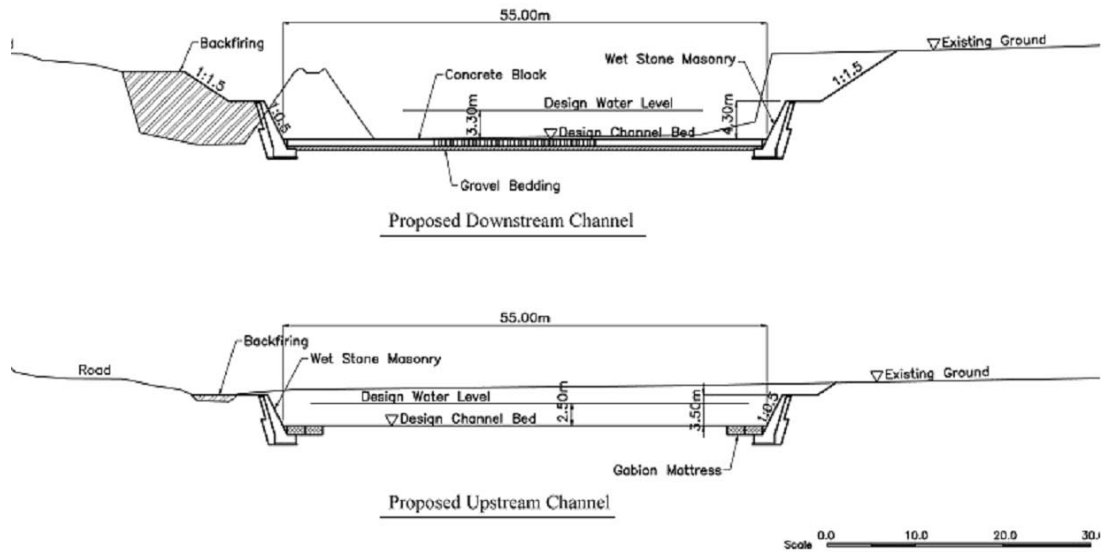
Typical Cross Section of Proposed Channel Works
